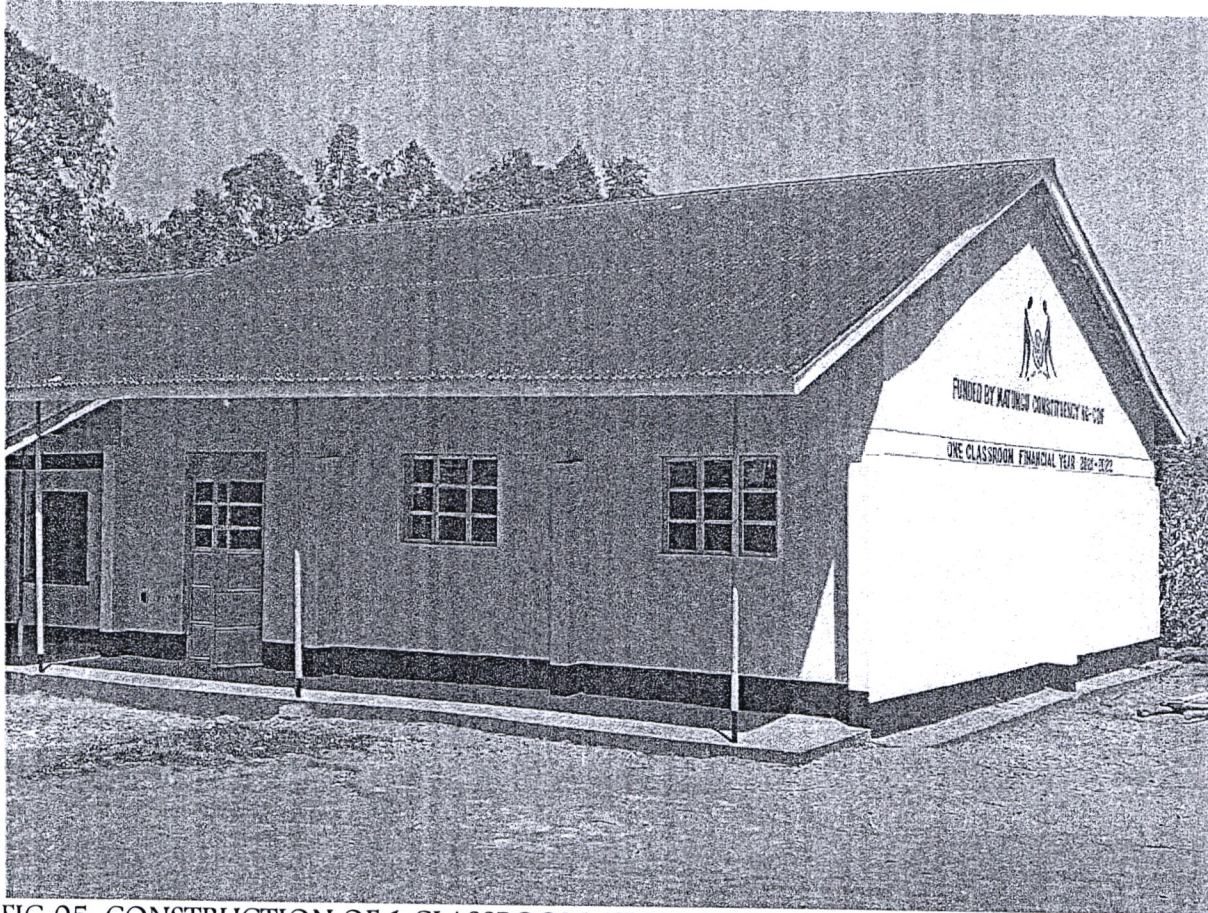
CONSTRUCTION OF 1 CLASSROOM AT BULONGA SECONDARY SCHOOL FY 2021/2022
